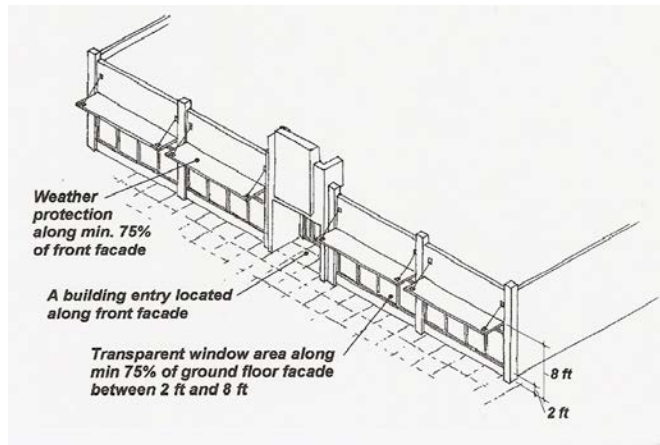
Sidewalk coverings are intended to protect pedestrians from exterior elements.
